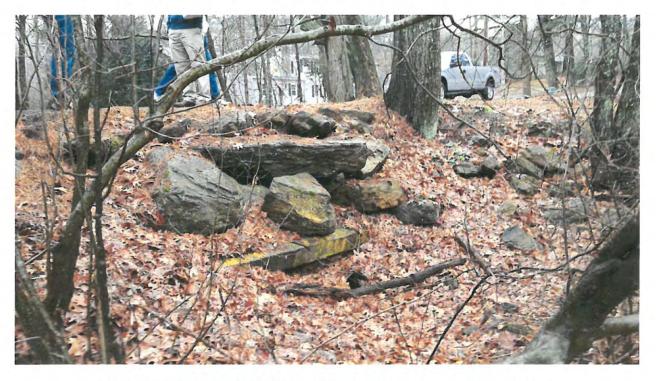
Photo B: Looking south towards upstream end of existing 12" CMP culvert
